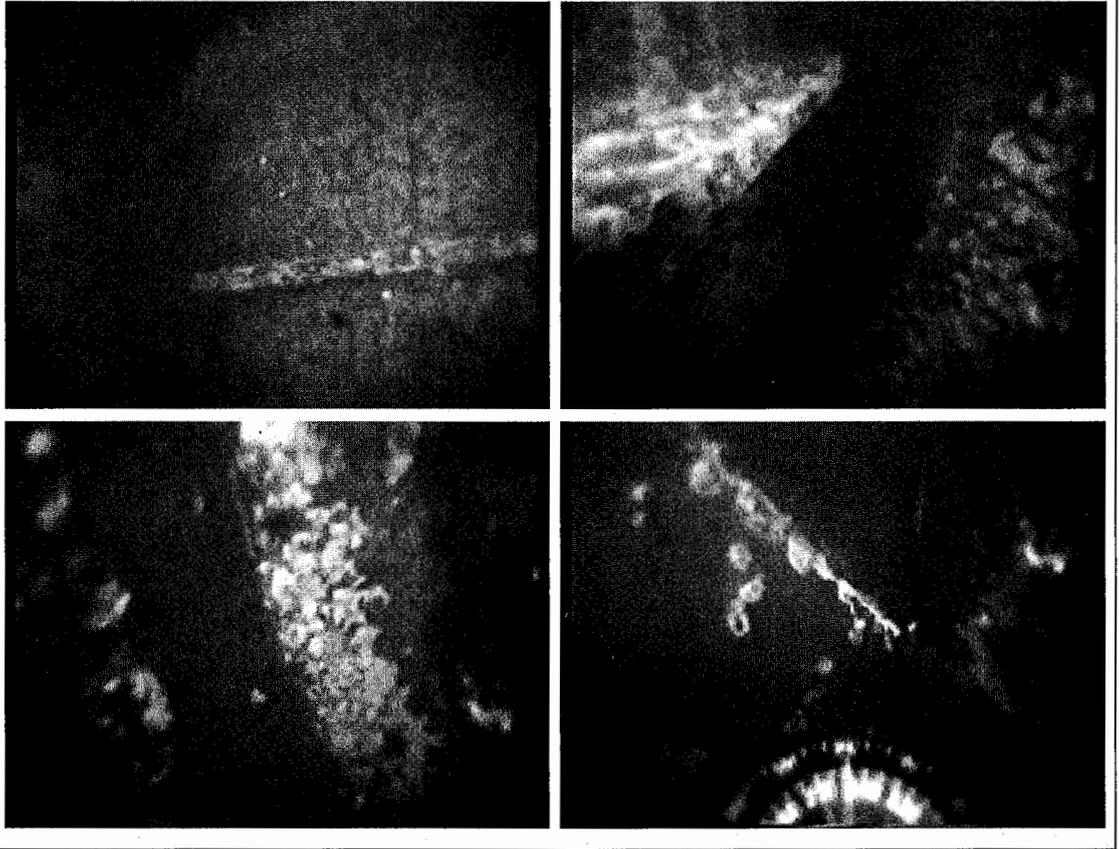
Video clips from a remotely operated submersible vehicle inspection: rotary valve ball (top left and right); steel conduit joints showing countersunk rivets at the flange (bottom left); and pipe seams (bottom right).
